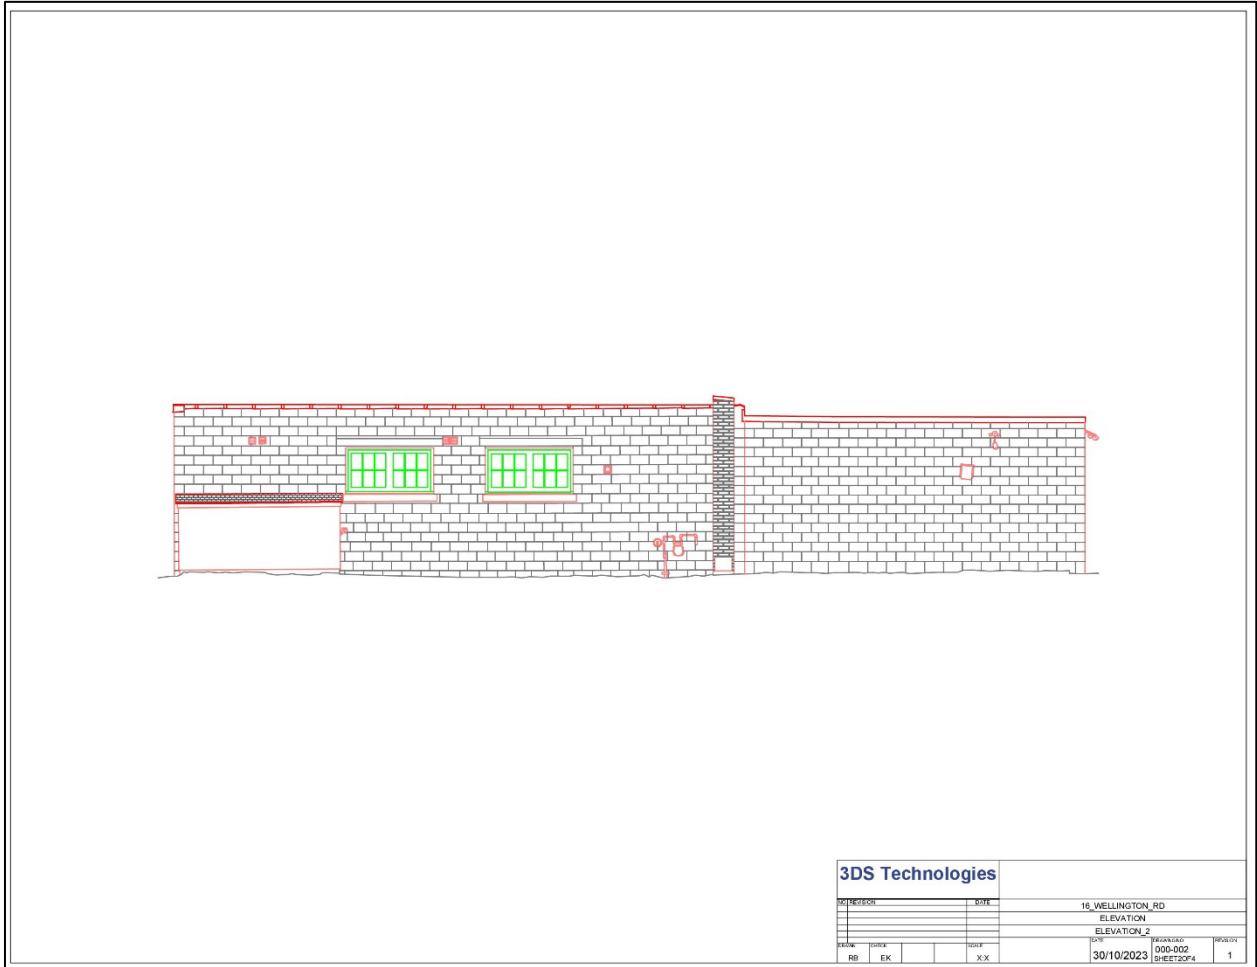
North elevation of the building at 16 Wellington Road (3DS Technologies, dated October 30, 2023).
